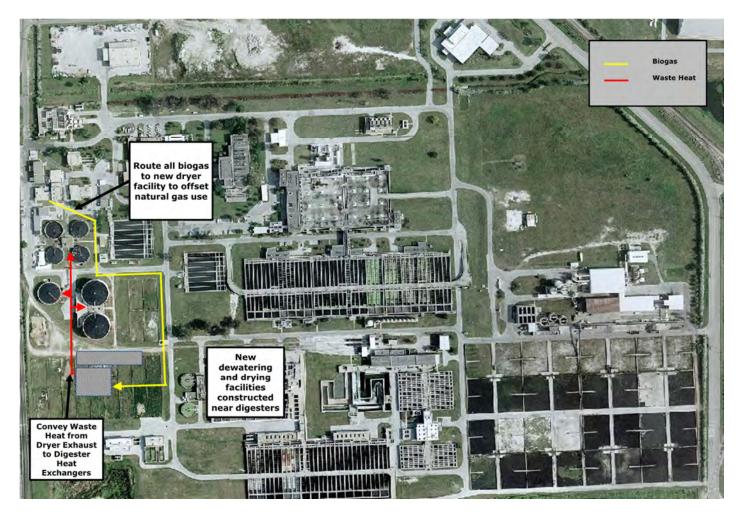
Alternative No. 6 Conceptual Level Site Plan
